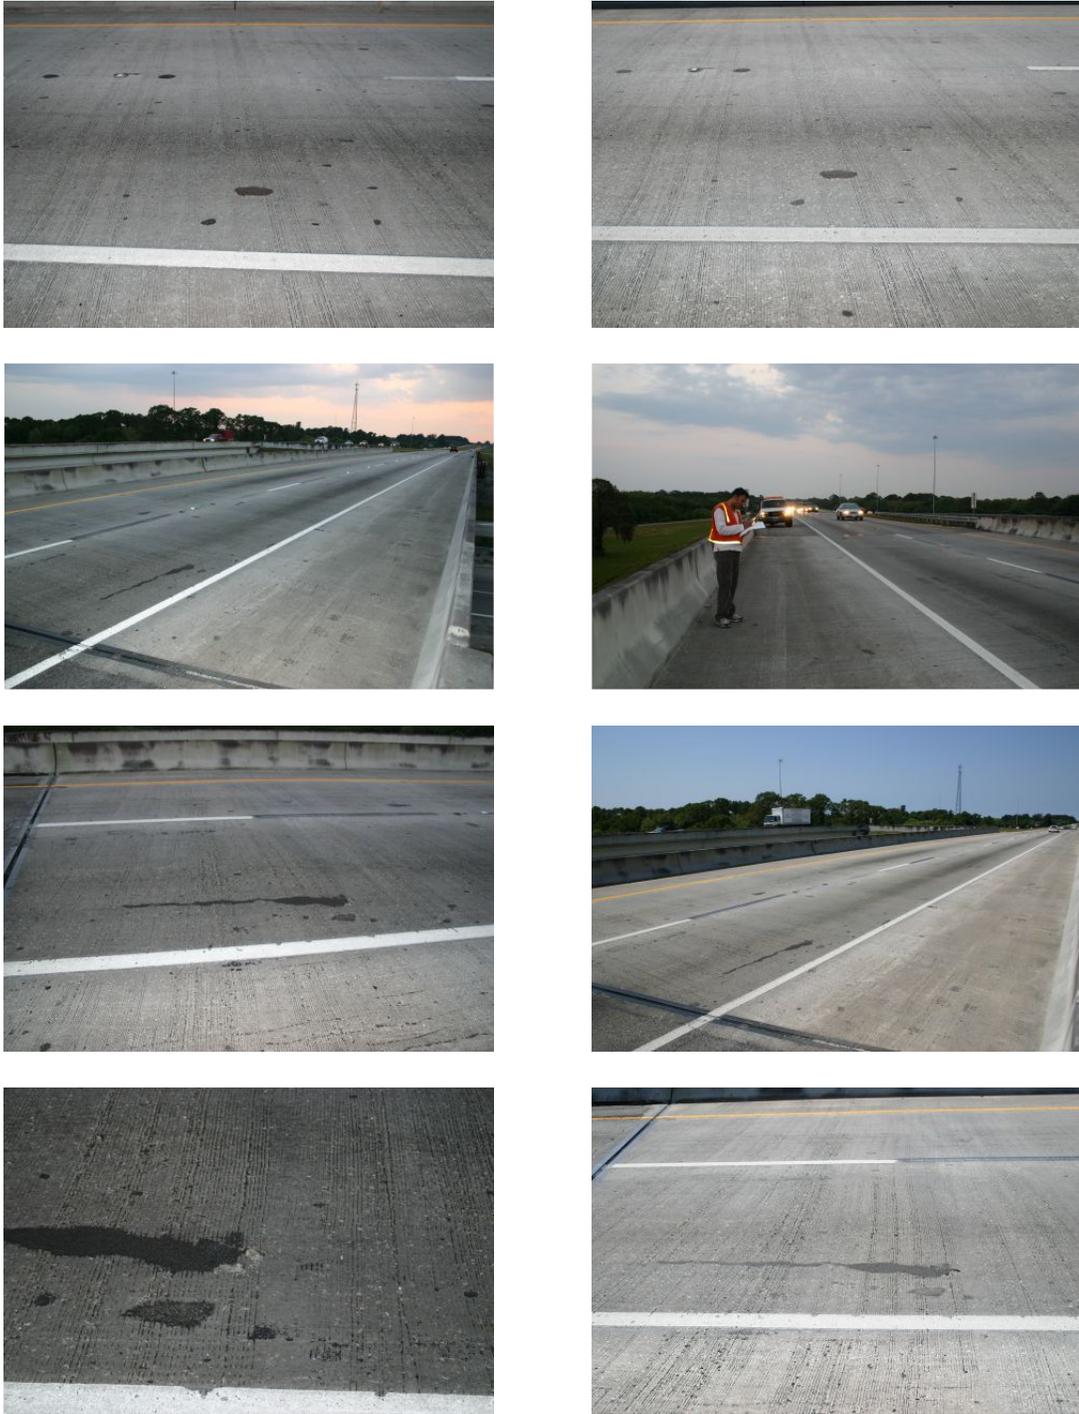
District 1 Bridge # 170089, I-75/SR-93 & River Road/Cr 777
